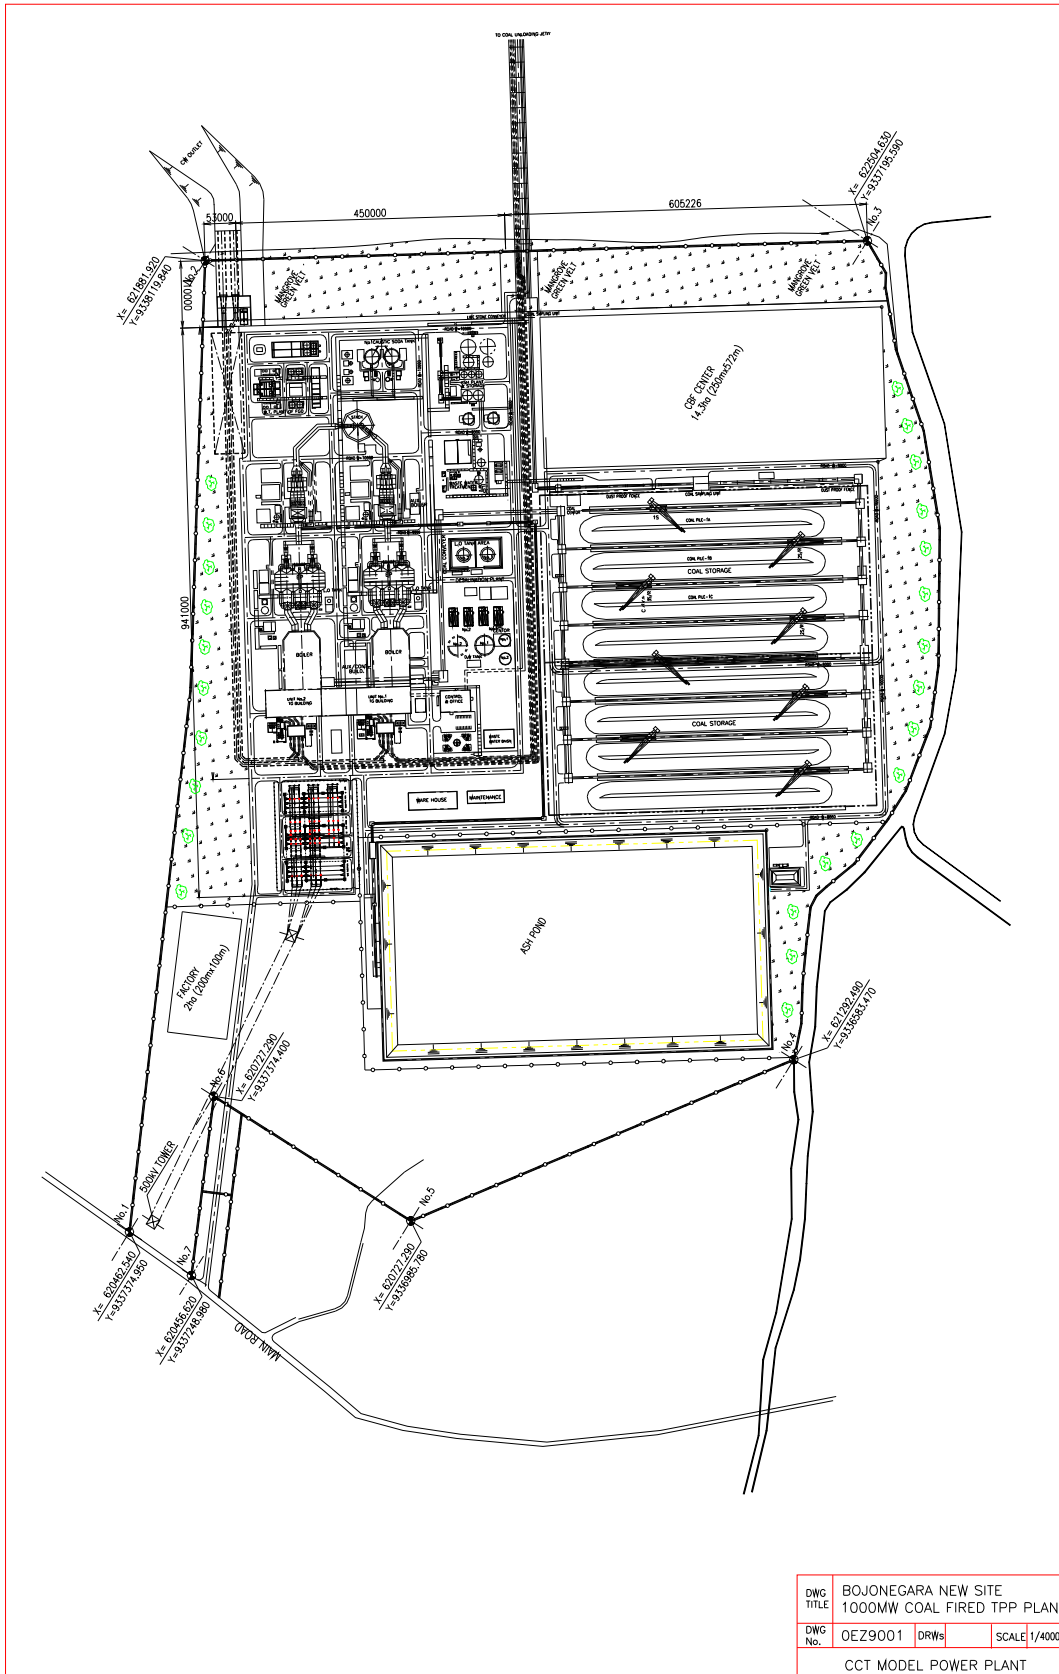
General layout for Planed Coal Fired Power Plant
